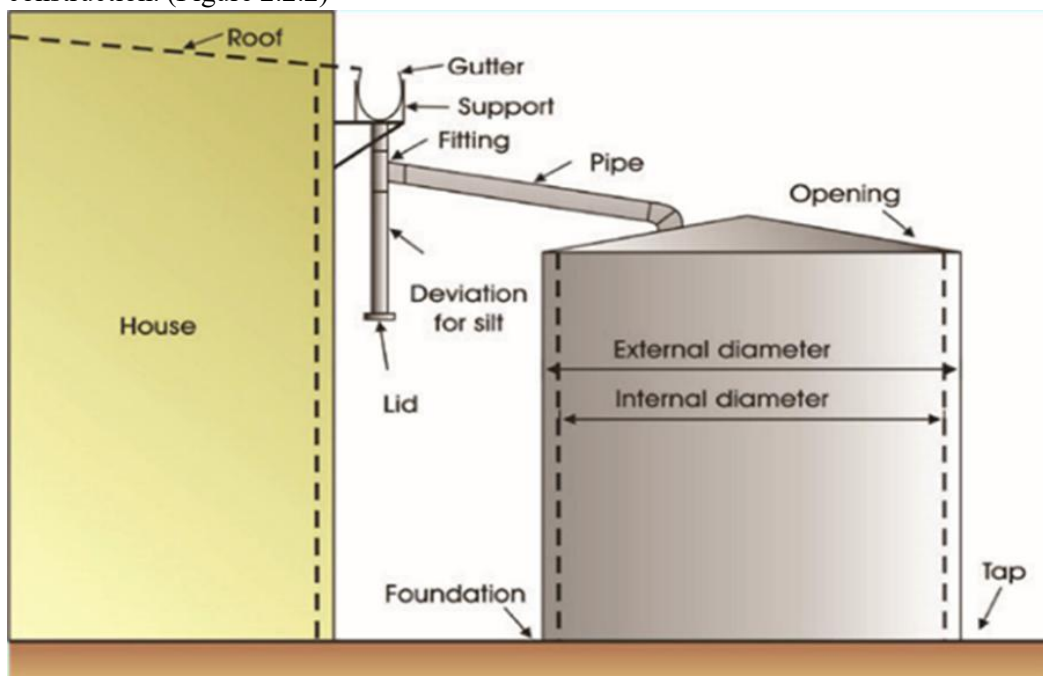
Components of a household rainwater harvesting system showing gutter, downpipe, silt diversion, inlet pipe, storage tank, lid, and tap outlet.
